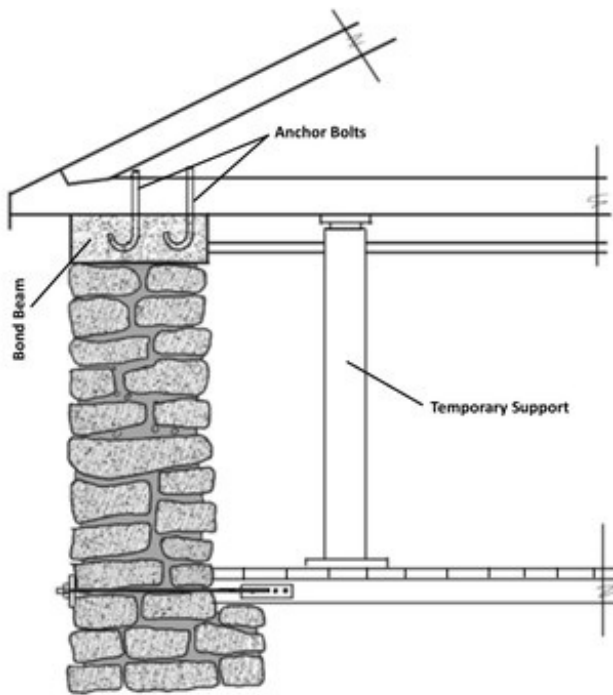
A new RC band must be anchored to the roof (adapted from: Tomazevic 1999)
